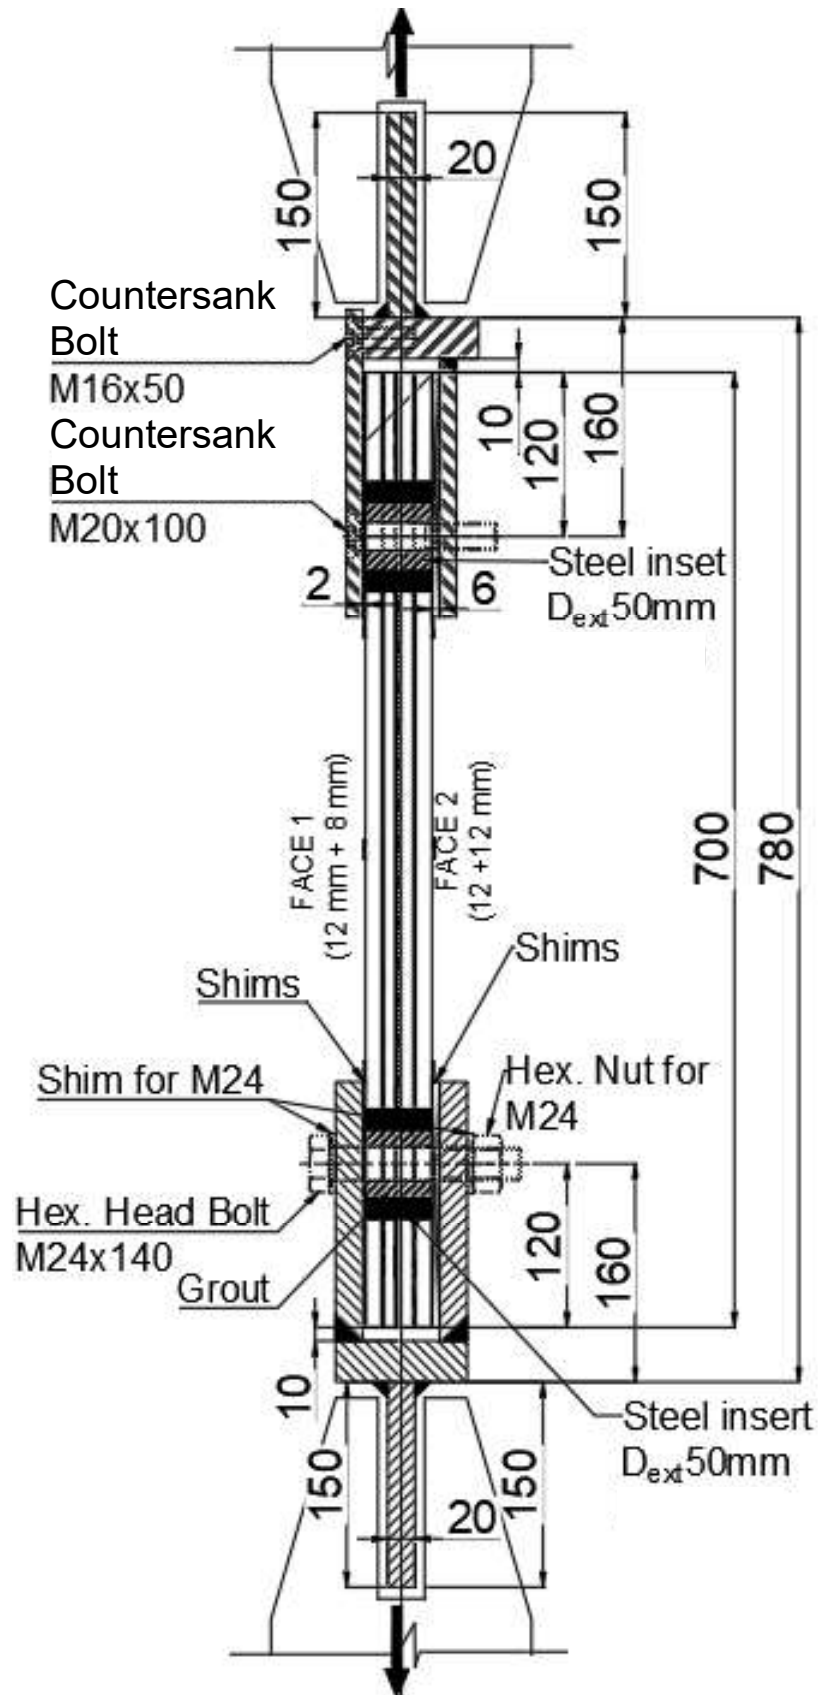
Uniaxial tensile test – Test layout configuration [7]
